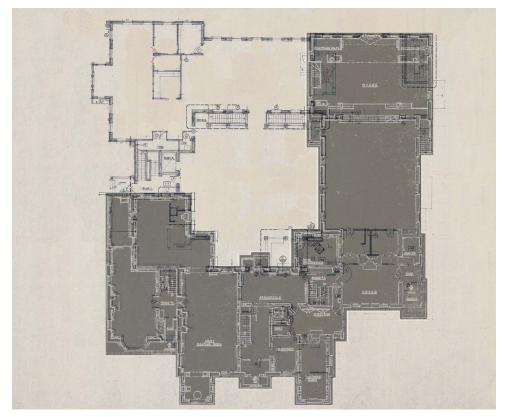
First-floor overlay. This composite image shows the 1928 floor plan (in gray) laid over the 1990 footprint. The 1990 addition is basically attached to the original building without much alteration to the original floor plan.
